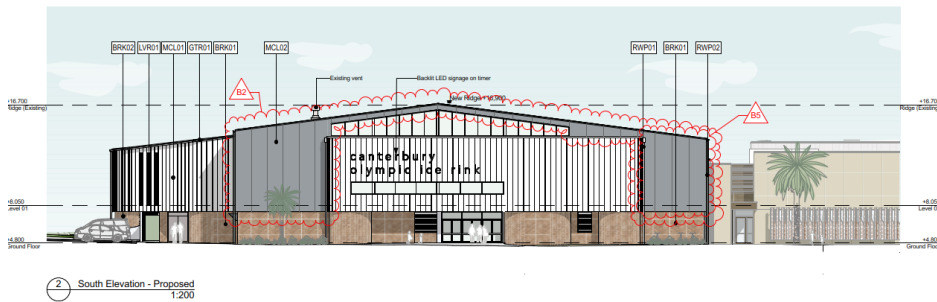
Proposed Southern Elevation (Source: Kennedy Associates Architects 2024 2221-DA201 Rev C)
